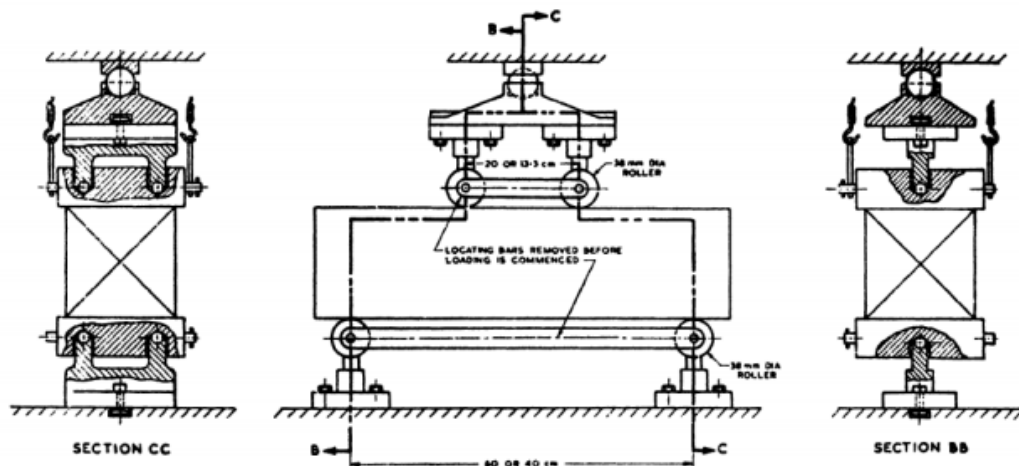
ARRANGEMENT FOR LOADING OF FLEXURE TEST SPECIMEN
